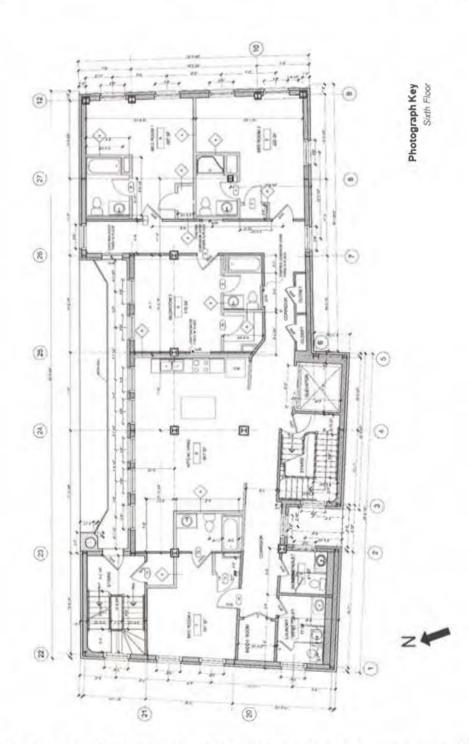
Sixth-floor plan (2016). Reproduced by permission from the current owner, Wallachia LLC.
